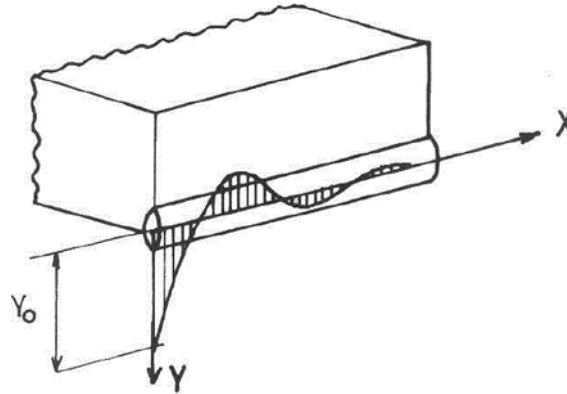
Beam in elastic foundation theory for the dowel mechanism (Walraven, 1980)
